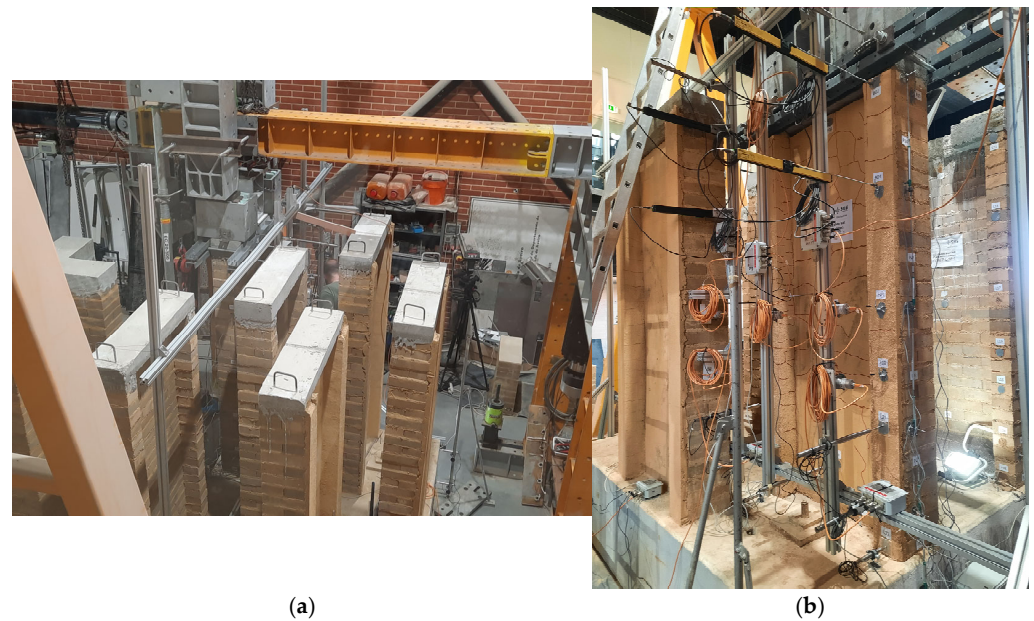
(a) C-panel specimens constructed for out-of-plane bending shear testing. (b) Instrumented wall for testing.
